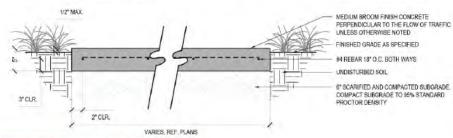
, Typical Trail Pavement Section (Source: Norris Design)
